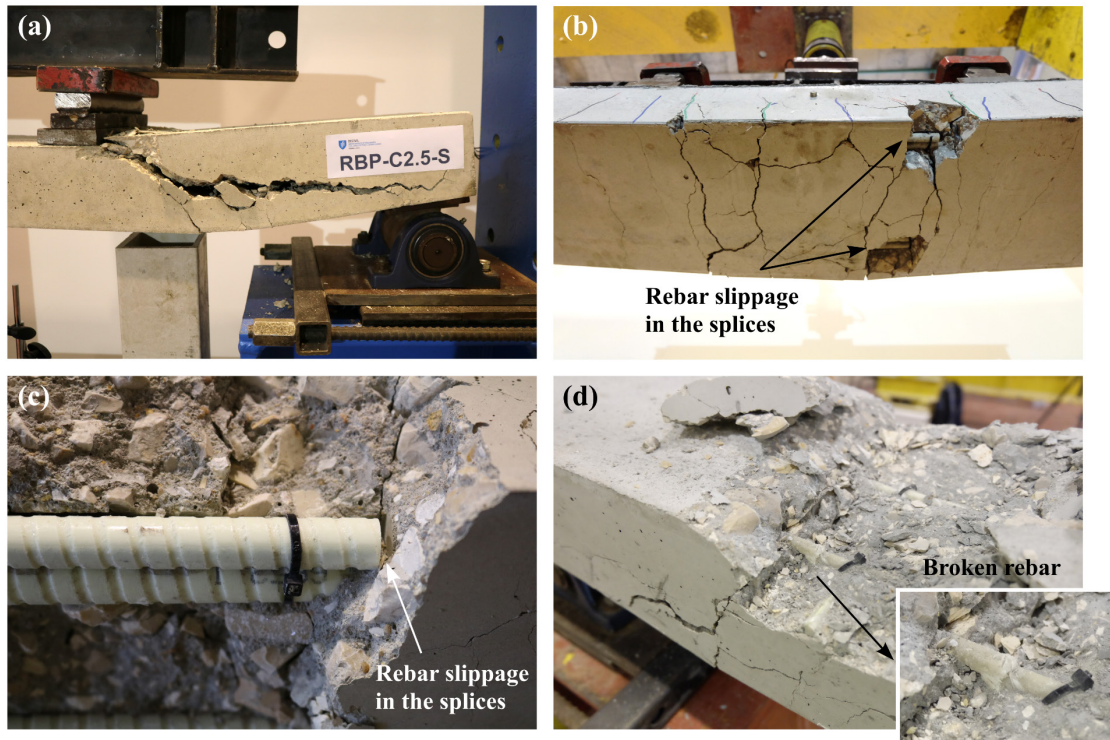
Typical failure modes observed in flexural tests performed in GFRP-RC slab strips at ambient temperature: (a) shear failure; (b,c) rebar slippage and local concrete spalling; d) section of GFRP rebar fractured in transverse direction, aligned with shear crack.
